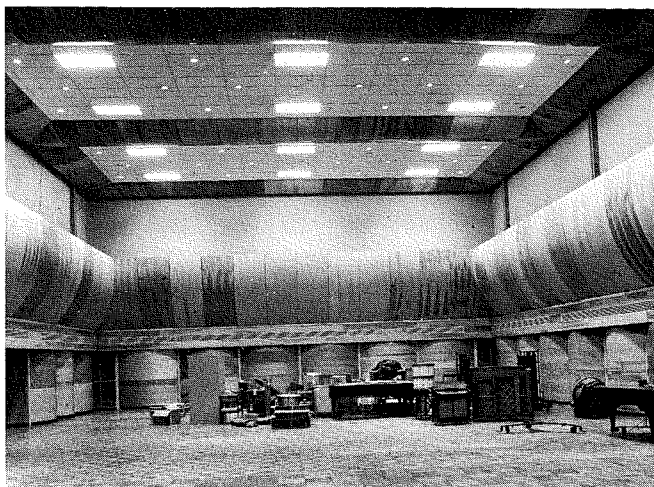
Looking toward the wall opposite the platform in Studio A showing the ceiling sections raised to full height. Each of the three main ceiling sections has six fixtures distributed over the middle or absorptive area (0.8 coefficient) and a perimeter consisting of reflective convex wood panelling 4 ft. wide (0.2 coefficient). This illustration also gives a better view of the 8-ft-high horizontal convex plywood panelling covering the middle section of the walls. This horizontal panelling is hinged at the lower edge and may be lowered in individual 8-ft-wide sections by means of manually operated winches.
